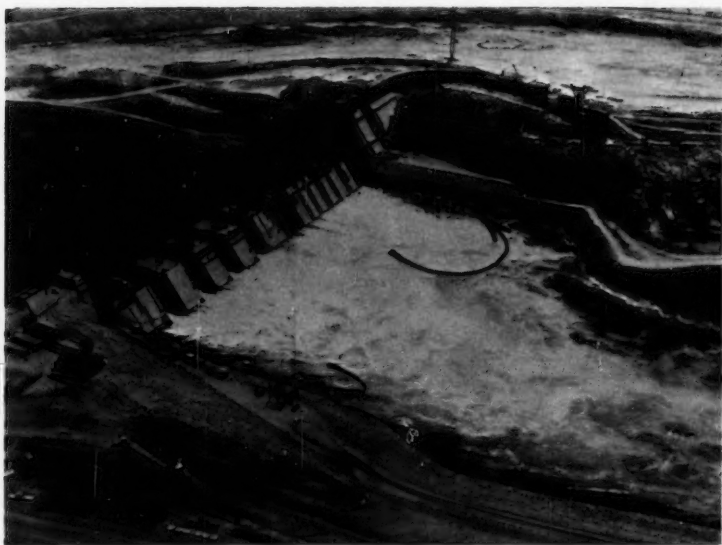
THIRD STAGE CONSTRUCTION DURING HIGH-WATER
